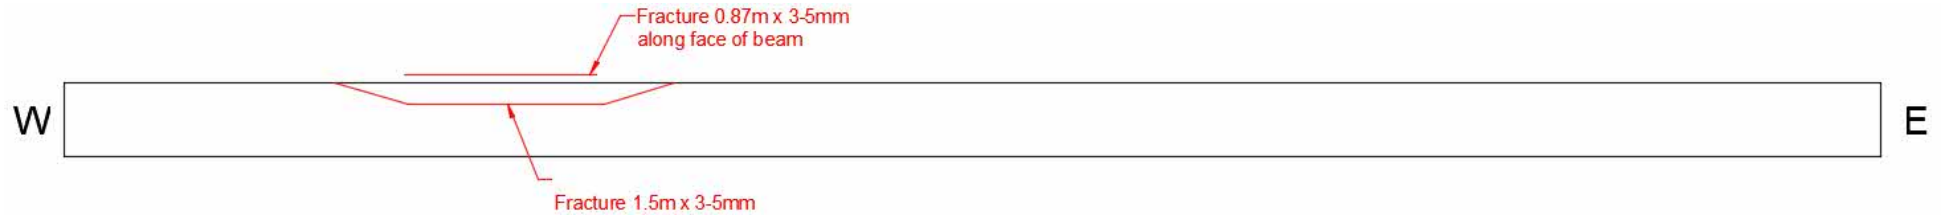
Plan View of Beam No.7 Defects (Photograph 13)
